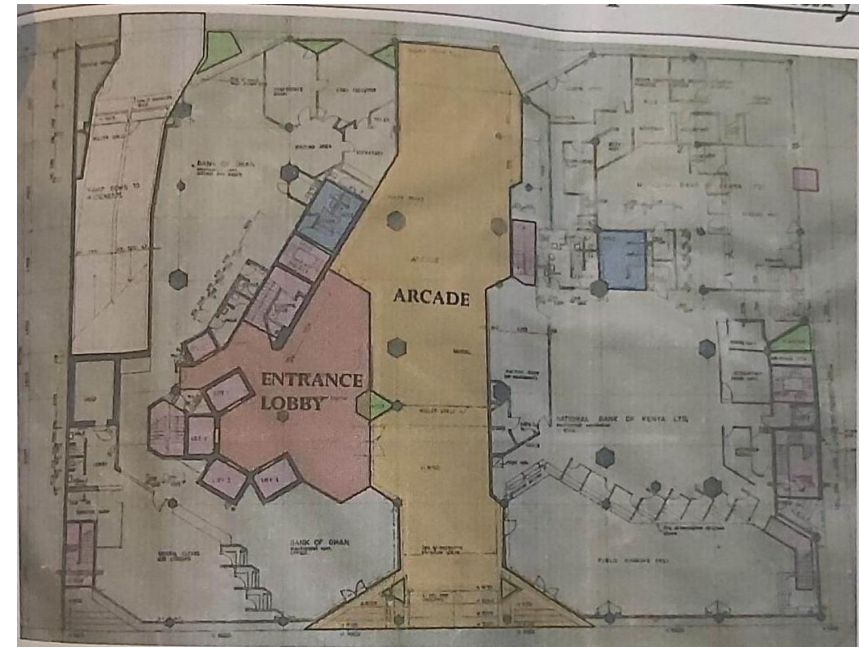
Image showing Ground Floor Plan of ICEA Building.
